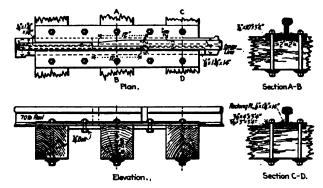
Expansion Rail Joint; Poughkeepsie Bridge.
